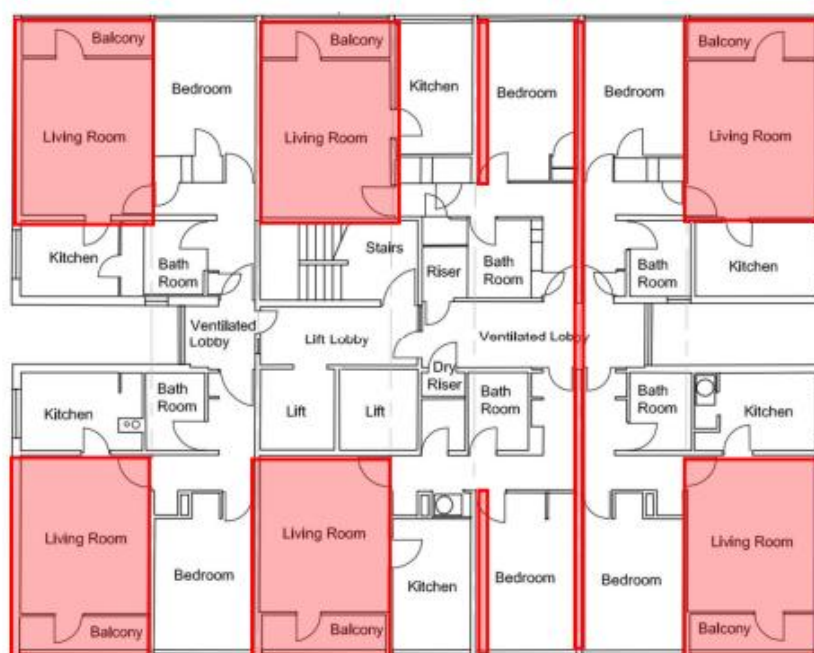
Typical Nettleton and Dudeney floor layout showing areas where strengthening is required
